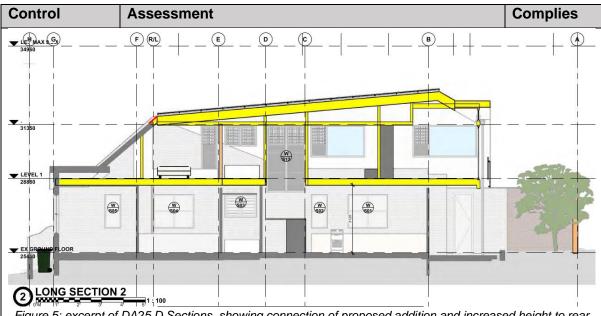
excerpt of DA25 D Sections, showing connection of proposed addition and increased height to rear of site.
